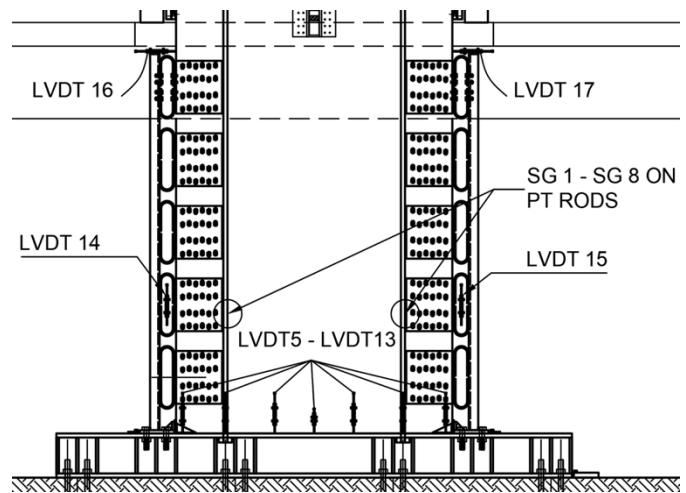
Instrumentation for rocking wall: (a) LVDTs at won East face, LVDT14 and LVDT15 measuring vertical UFP deformation, LVDT16 and LVDT17 measuring gap opening between steel column and wall panel, and strain gauges on high-strength rods.
